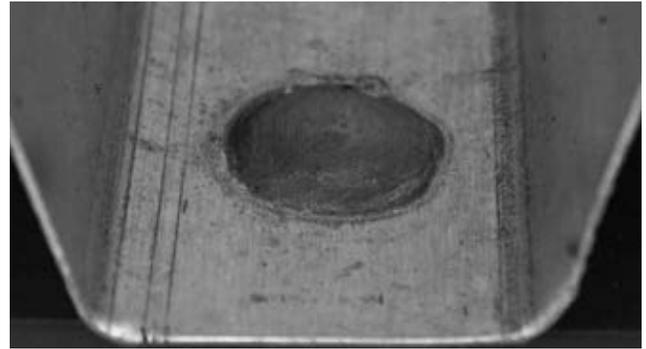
ARC SPOT WELD (weld to support)
